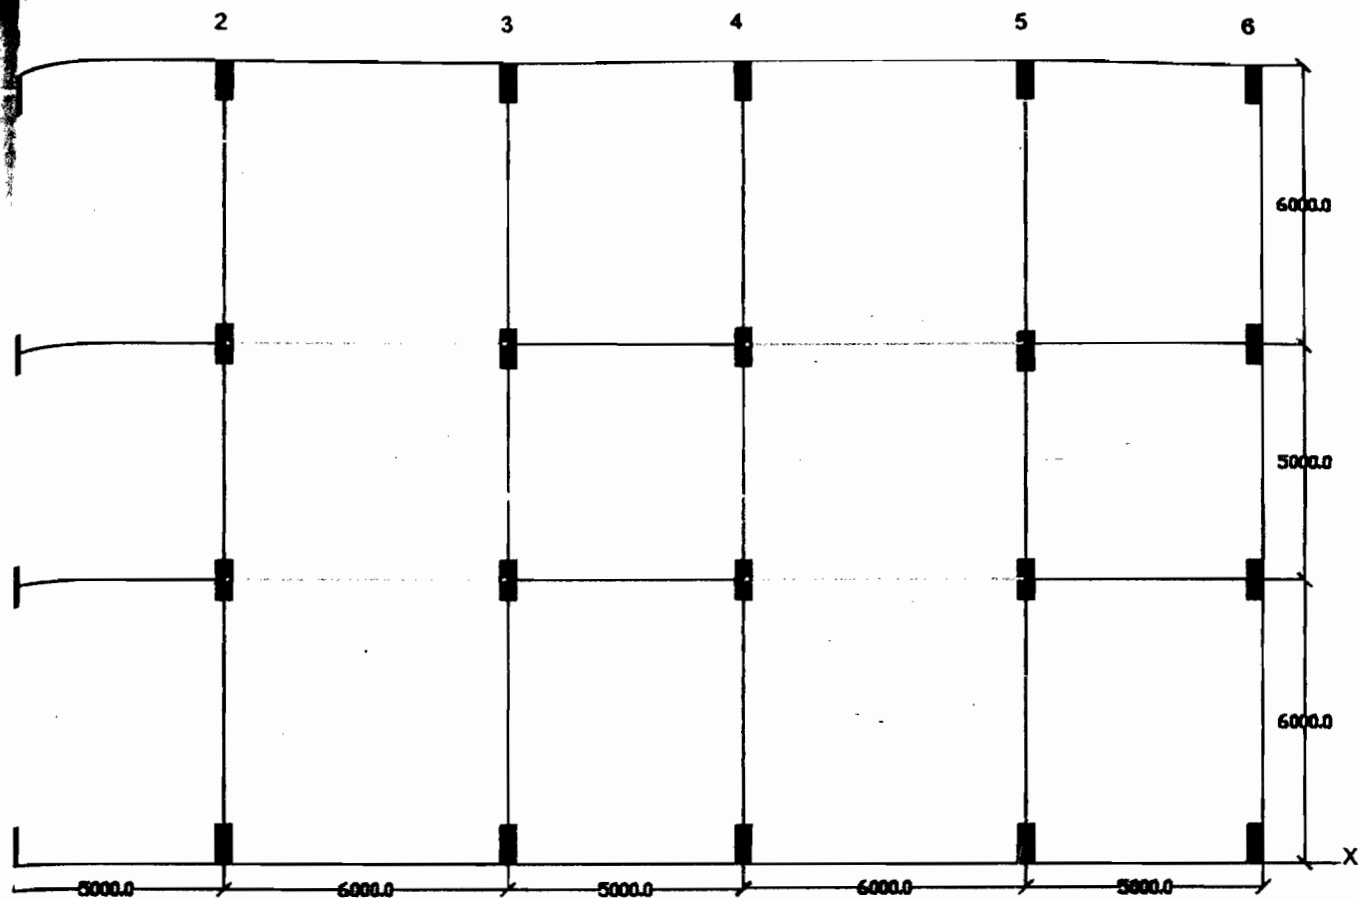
(a) TYPICAL FLOOR PLAN OF SYMMETRICAL MULTI STOREYED BUILDING OF EXAMPLE 2 (CASE 1)
